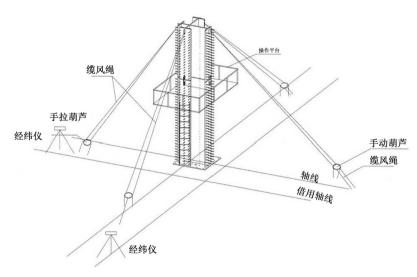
Schematic diagram of steel column hoisting correction and adjustment 图 5. 钢柱吊装校正与调整示意图
